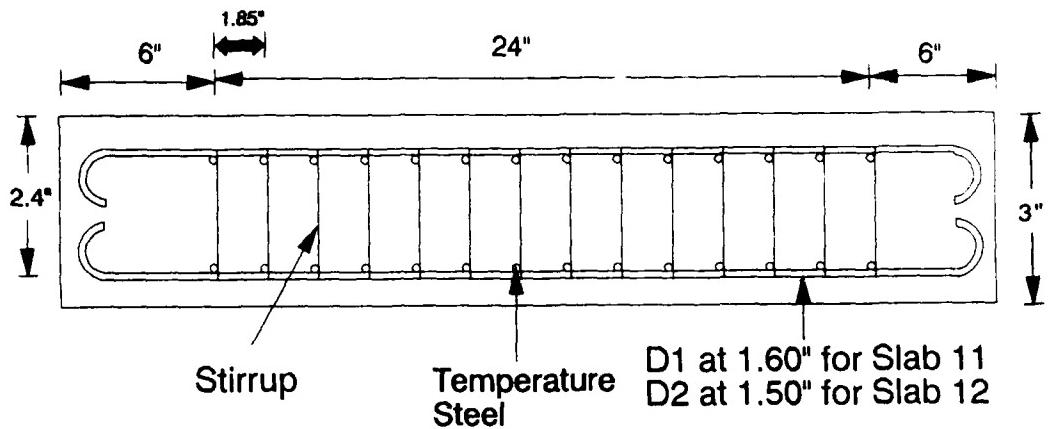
Sectional View Through Length of Slab Nos. 11 and 12
